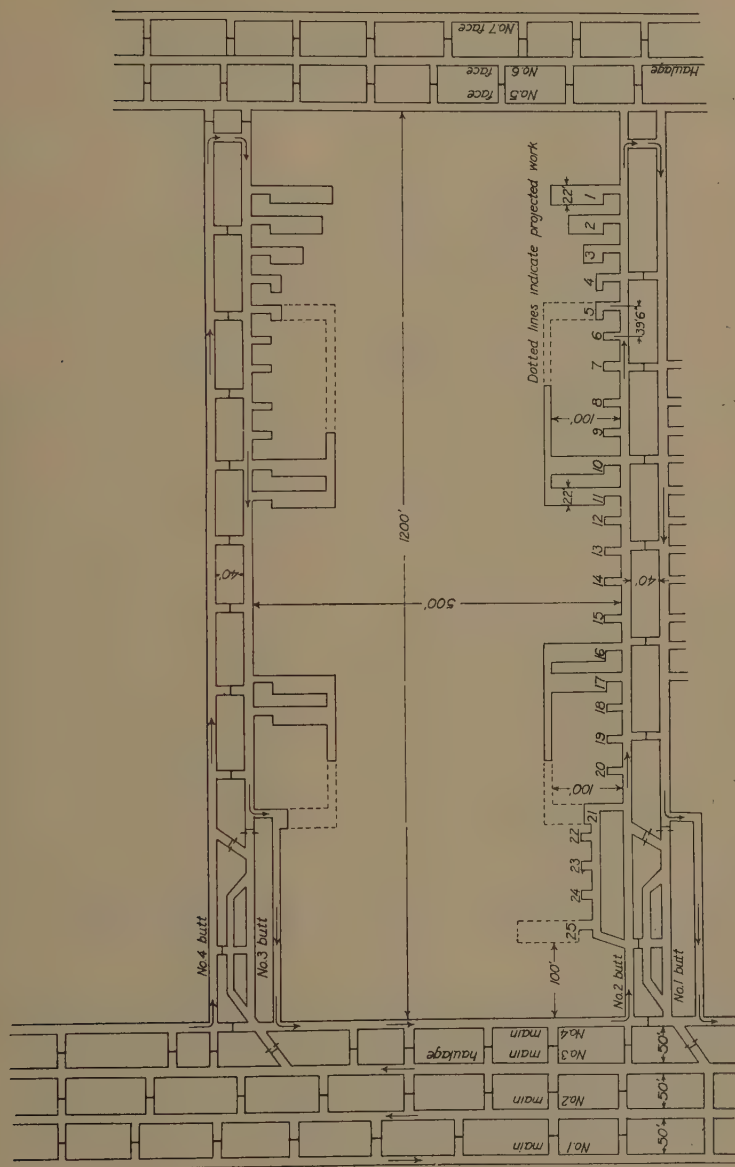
Sketch showing first step in method of drawing pillars, Pittsburgh Coal Bed, Western Pennsylvania.
